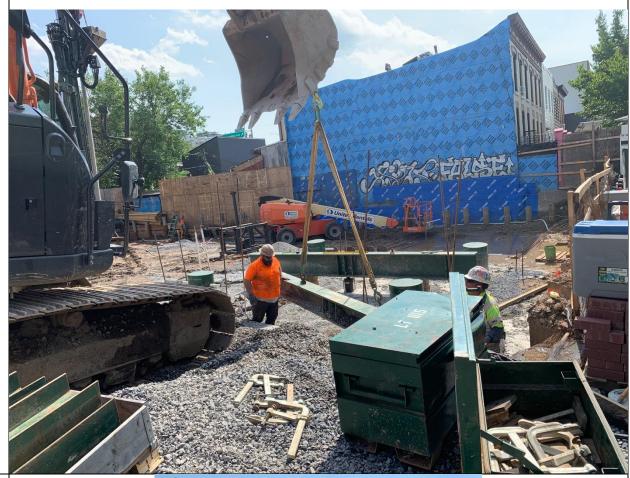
Overview of the site at the end of the day. View is facing north towards grid B2.
